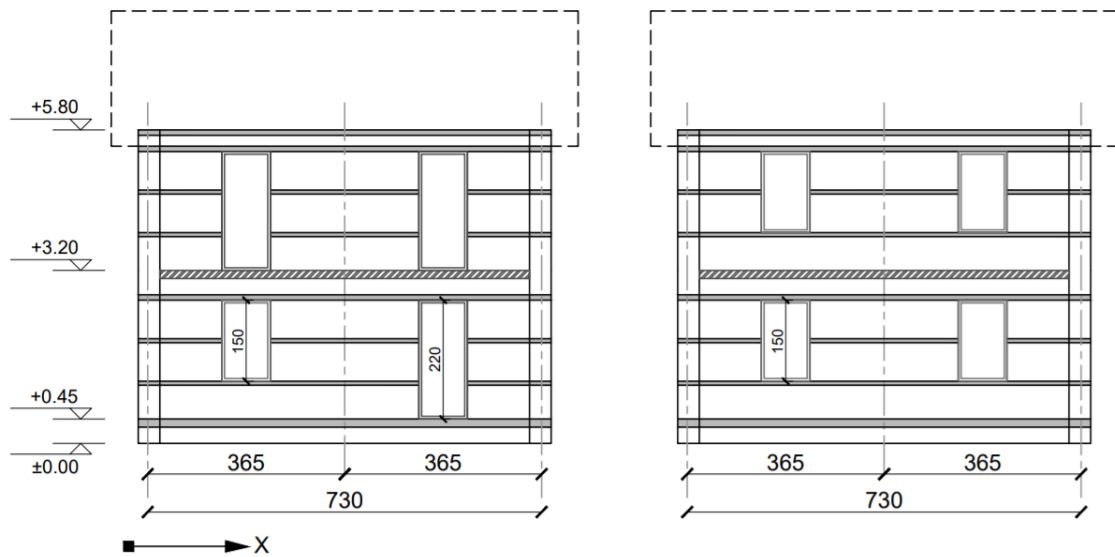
House elevations along X axis: Door wall (left); Window wall (right)
